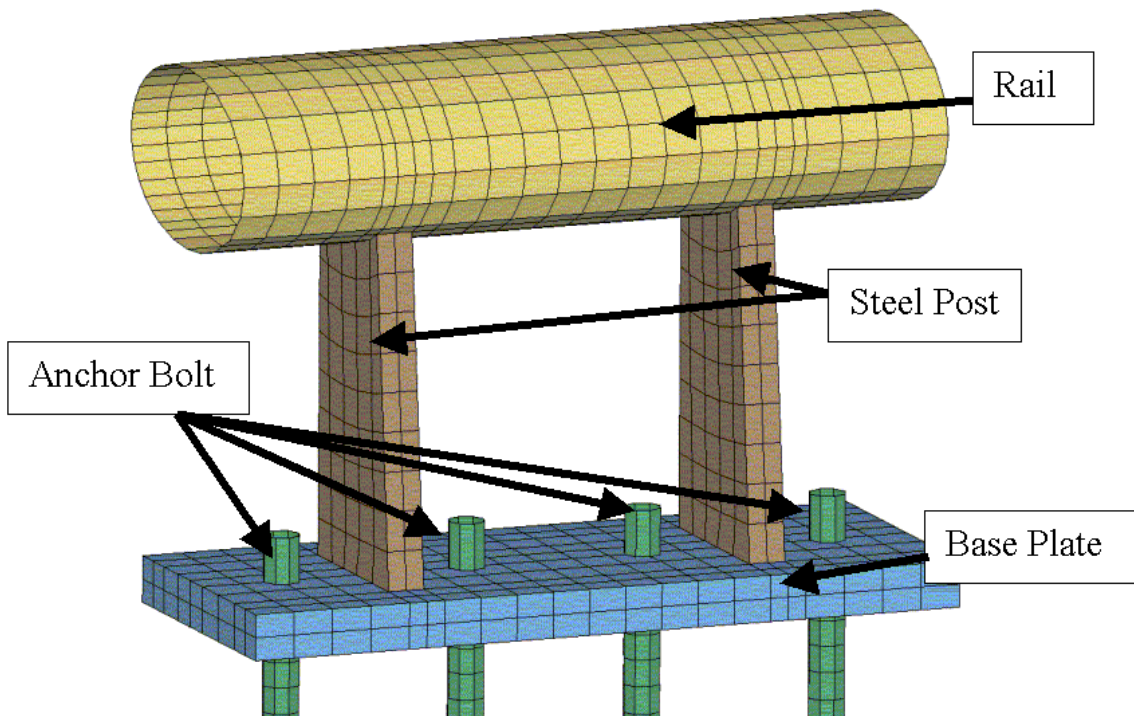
Closeup view of steel rail system with four-bolt anchorage.
